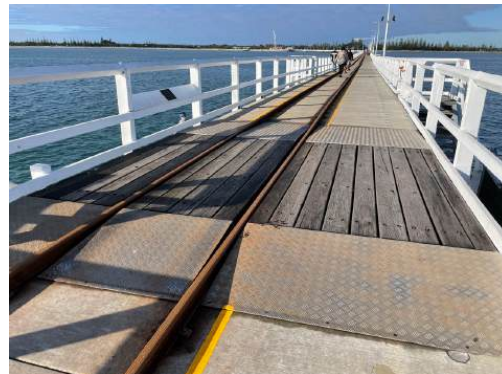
View of Jetty Section 5 with typical rampway for disembarking from tramway, Busselton Jetty. H+H Architects, 2022.
